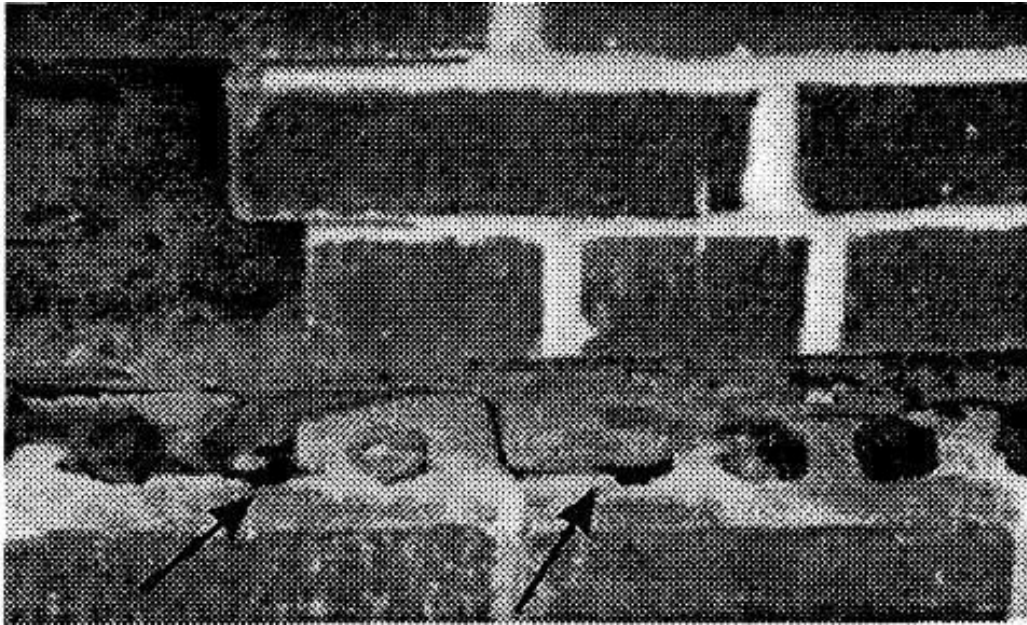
Opening in the parapet wall showing flashings, brick and the mortar interface.
